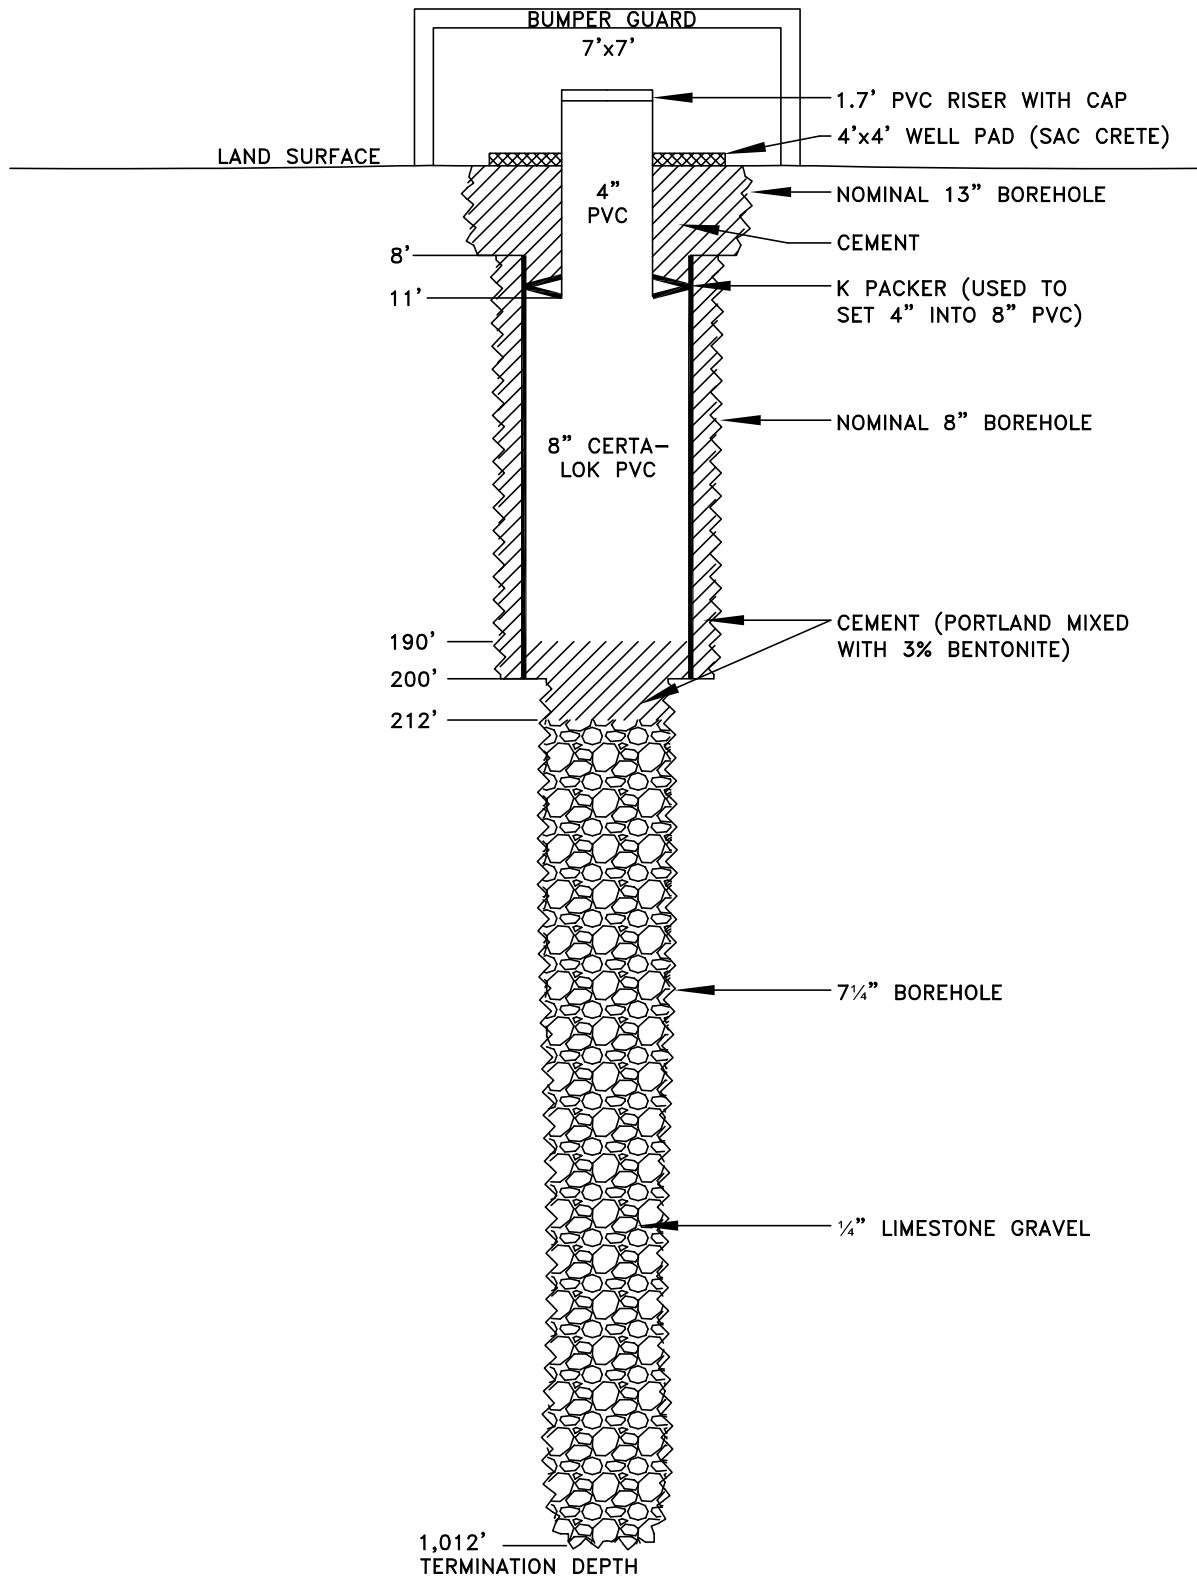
CCBRY-1 WELL CONSTRUCTION DETAILS.
